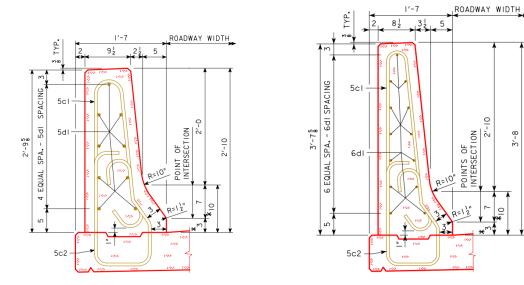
Typical TL-4 and TL-5 F-shape barrier rails
